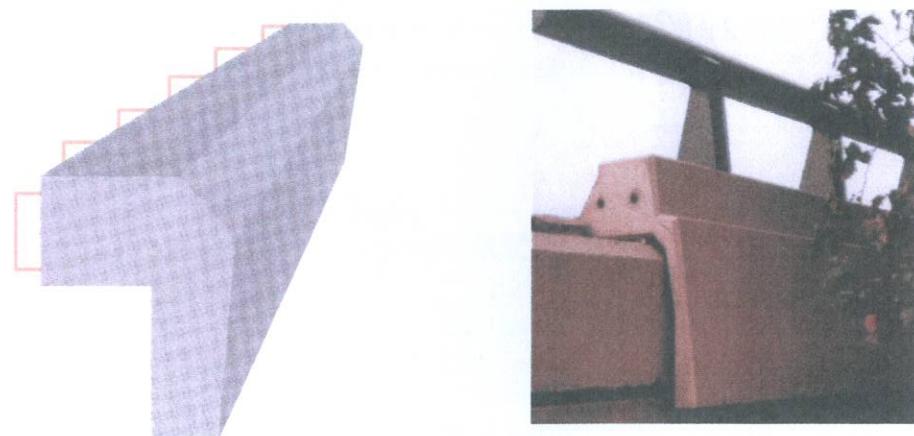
Simple precast profile to finish the cantilevering deck slab in a beam bridge
